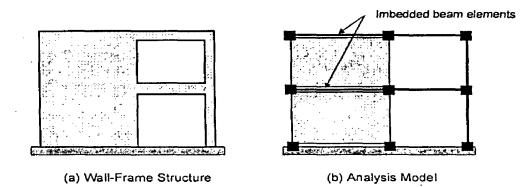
Modelling of Connection of Beam with Shear Wall
